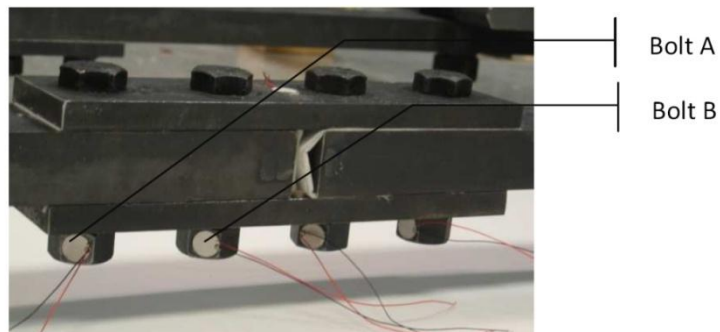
Insulated bolted joint in the experimental prototype with the PZT patches glued to the nuts
